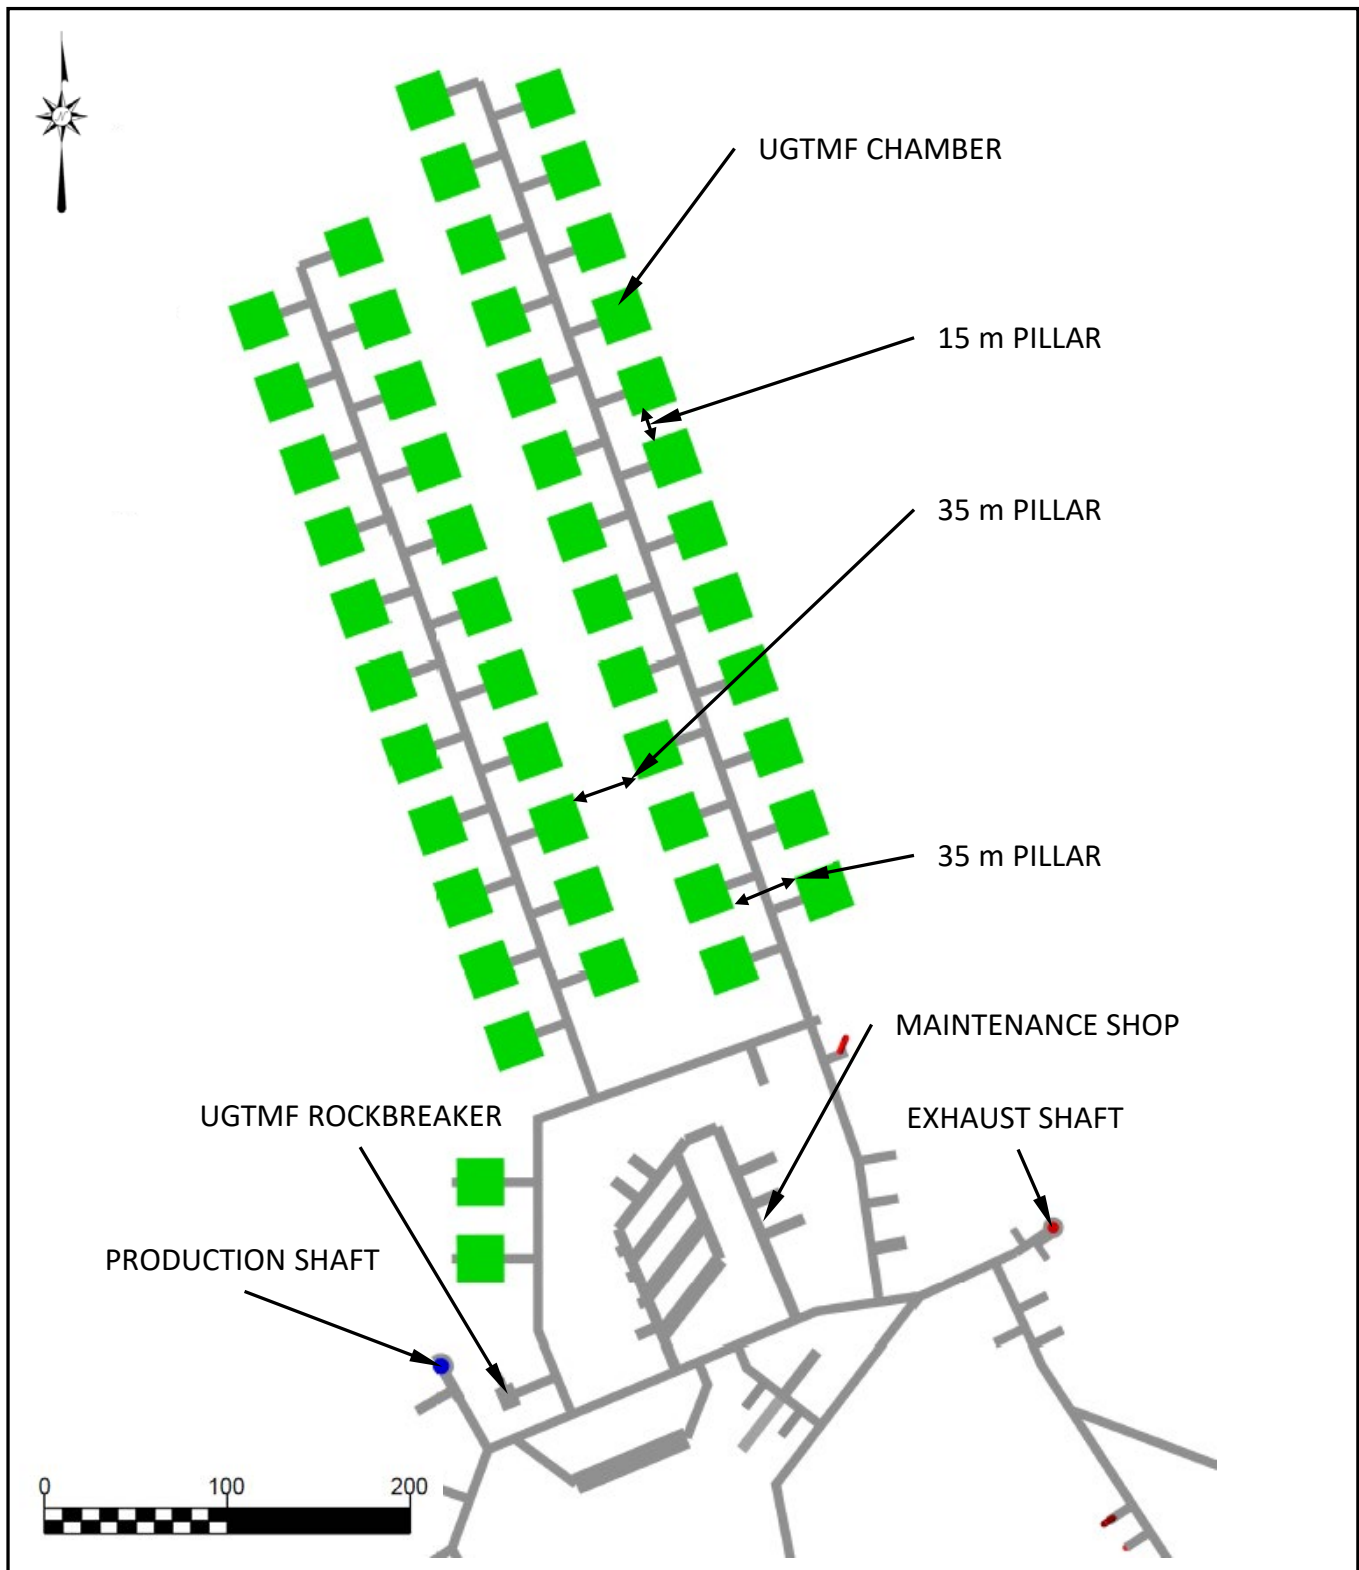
Rook I Project Underground Tailings Management Facility General Layout
